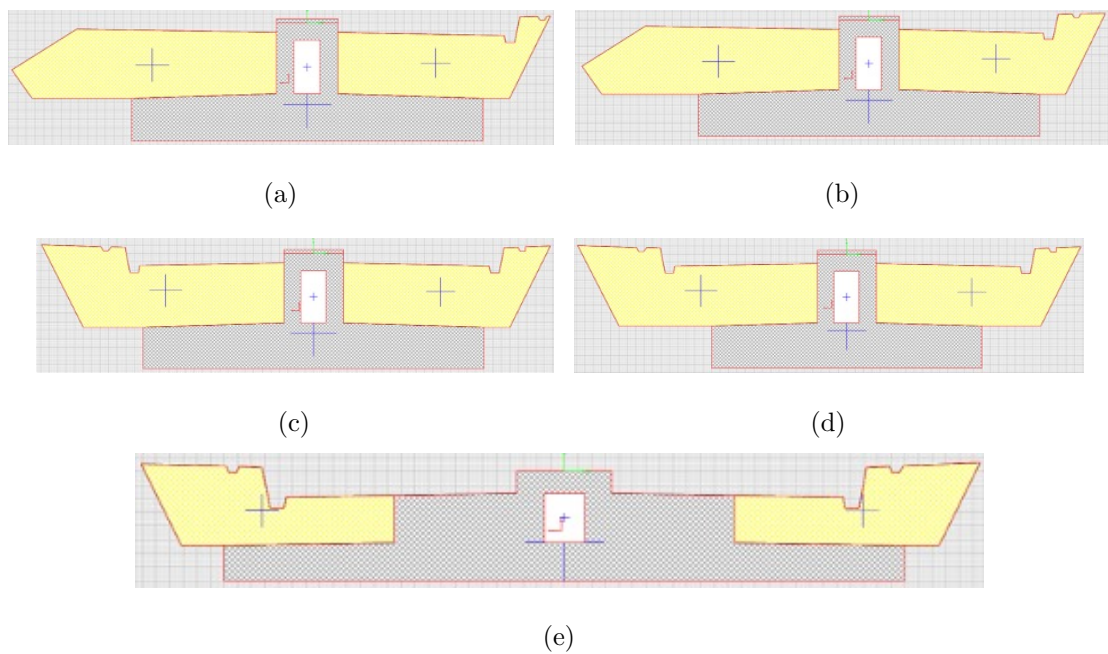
(a) Cross-section of the back span anchorage block in cross-section 1-1 in FEM, (b) cross-section 2-2, (c) cross-section 3-3, (d) cross-section 4-4, (e) cross-section 5-5.
